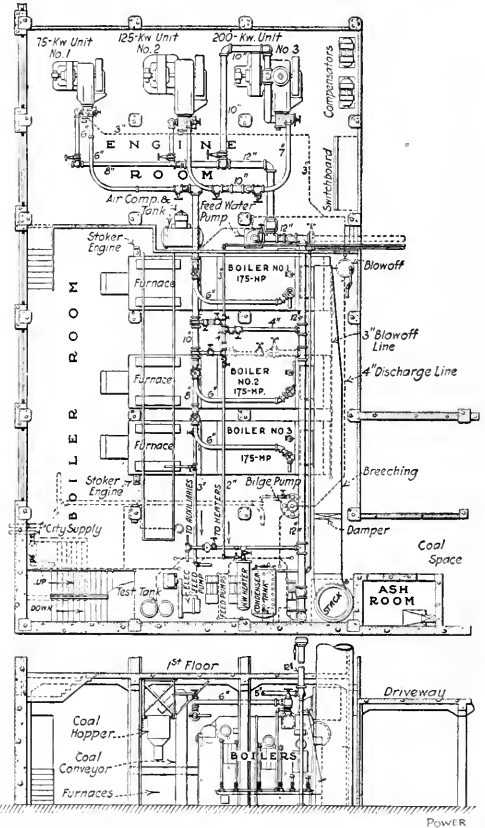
PLAN OF PIPING AND GENERAL LAYOUT OF THE NEW PLANT
